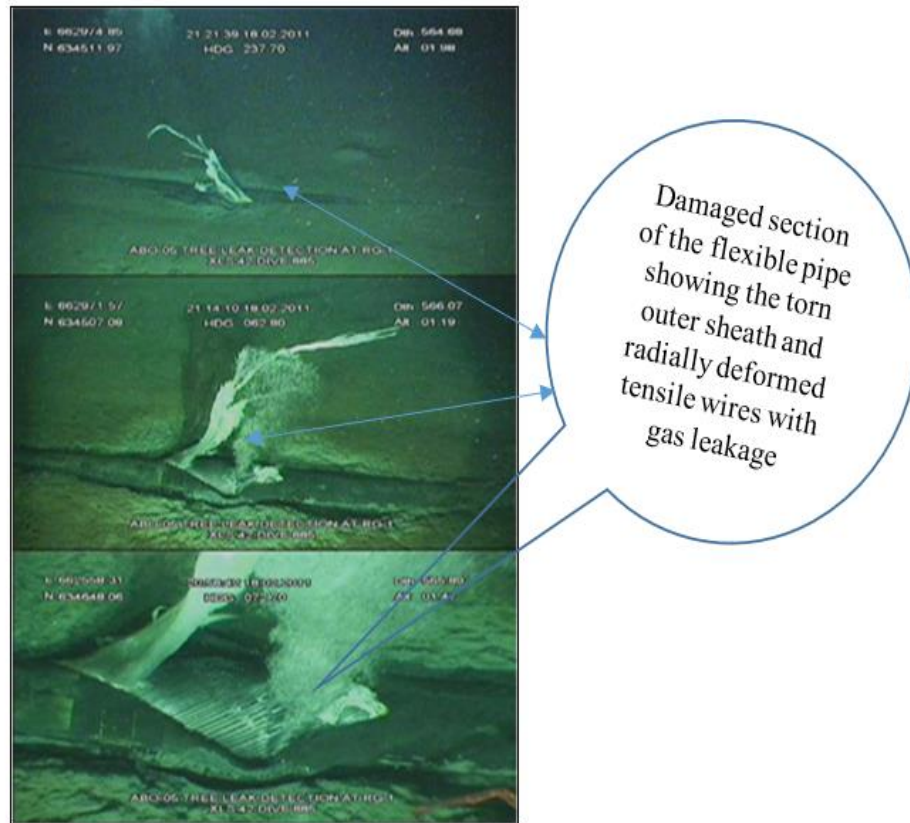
Subsea structural overview with ROV of flexible pipe failure [48]
